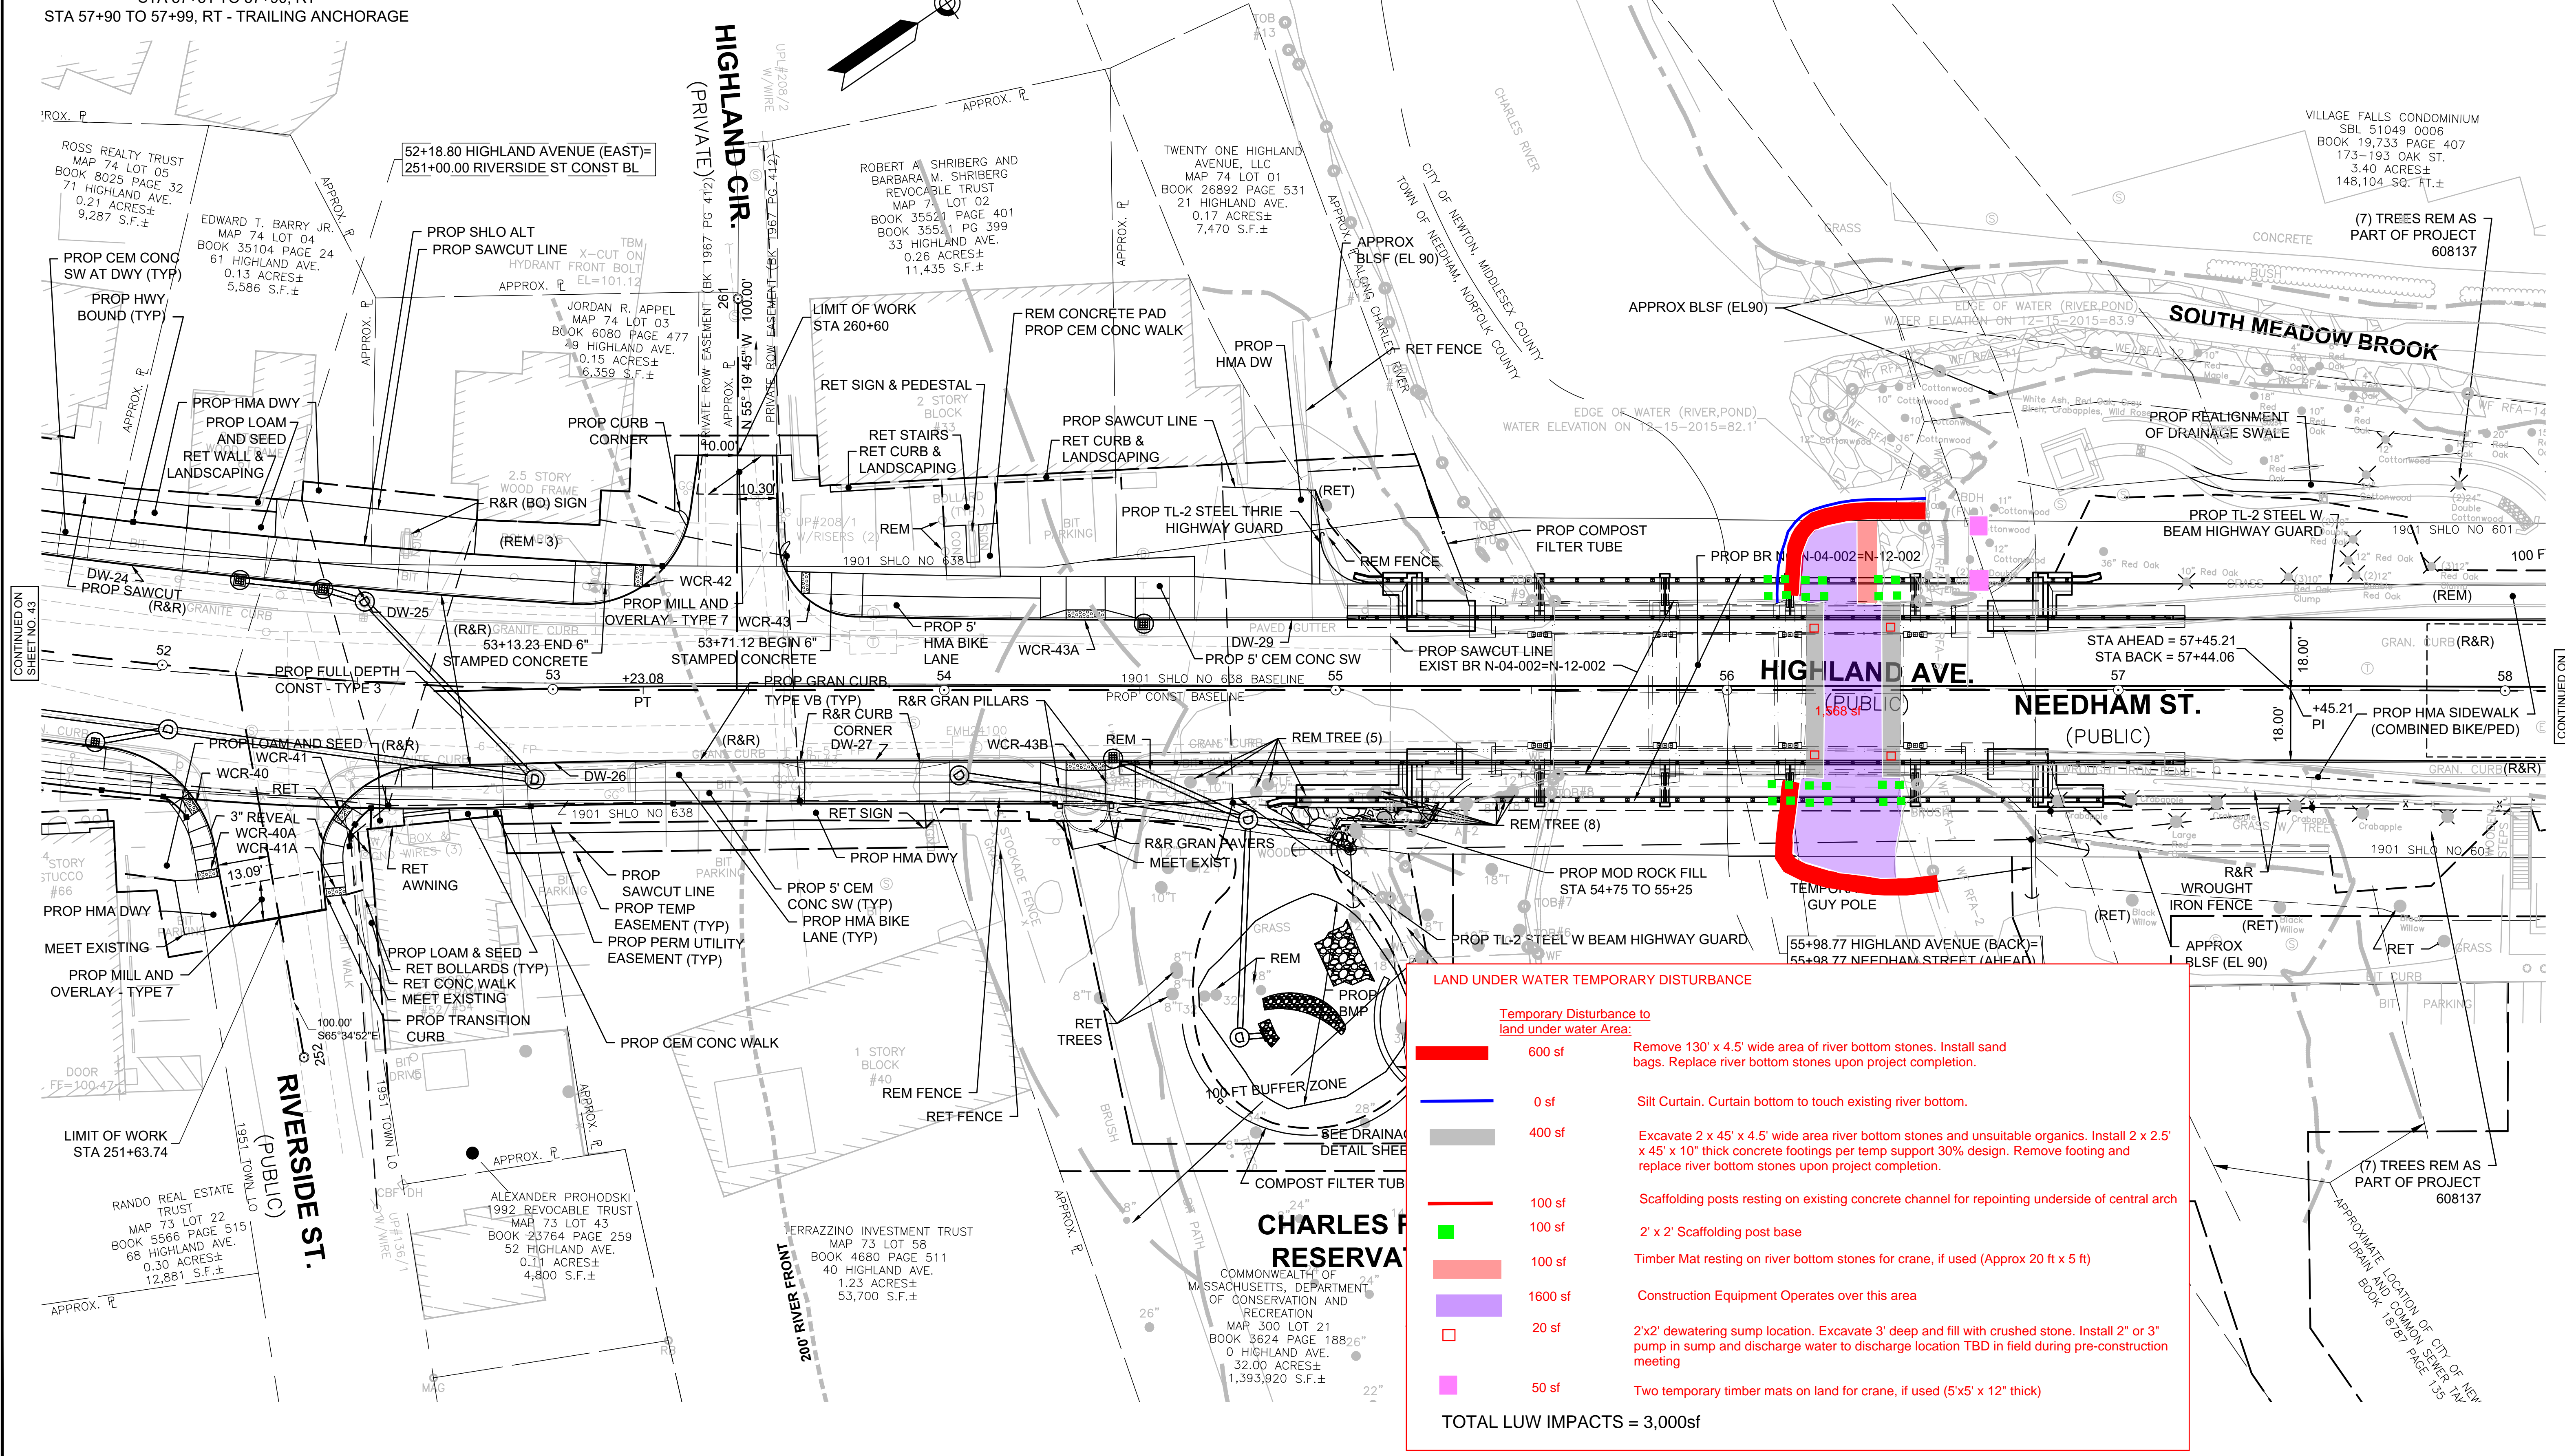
CONSTRUCTION STAGING FOR TEMP SUPPORTS AND ARCH RE-POINTING - NORTH SPAN
